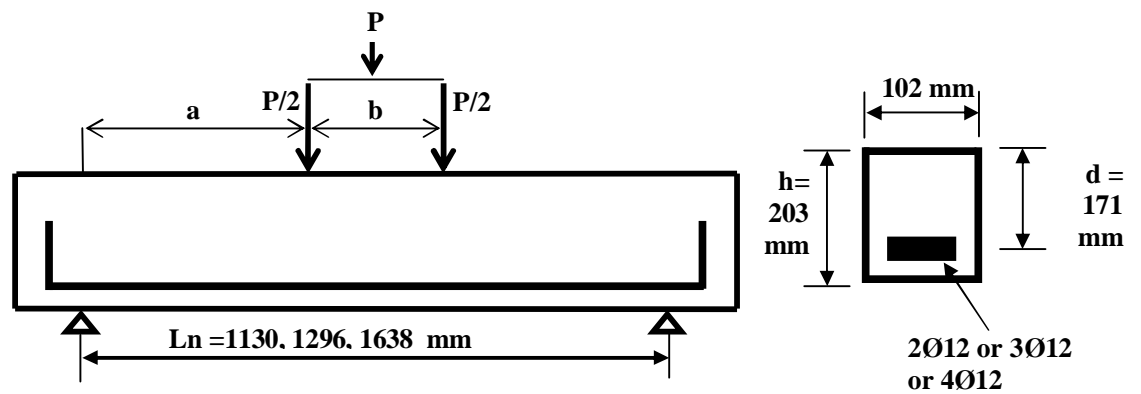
Dimensions and reinforcement details of Al-Dhalimi beams[2].
